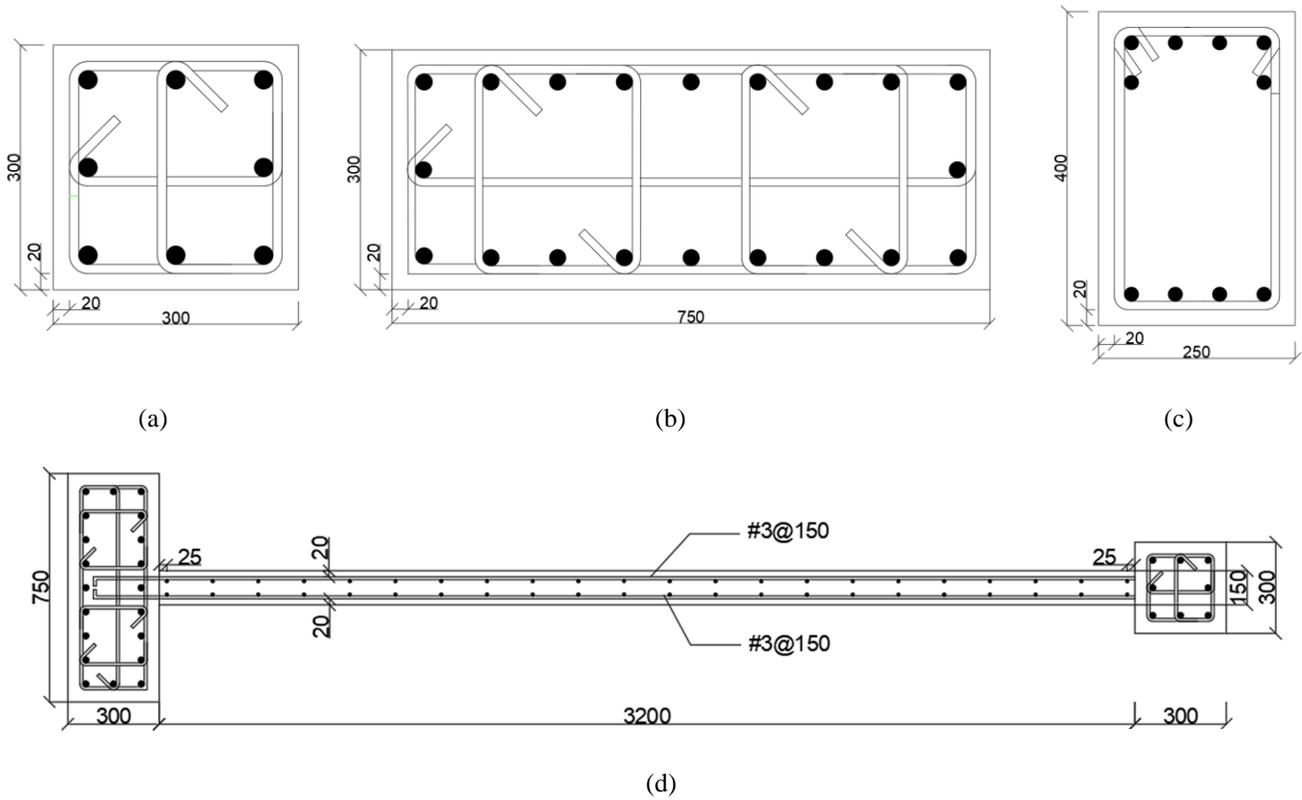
Cross-sectional dimensions of (a) square columns, (b) rectangular columns, (c) beams, and (d) infilled shear walls. [unit is in mm]
